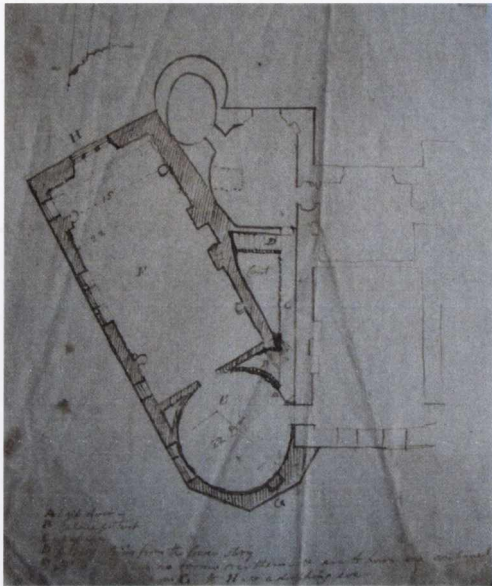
Birr Castle, proposed plan of new drawing room, attrib. to John Johnston, [1802–1804], Rosse papers, O/17/20.
